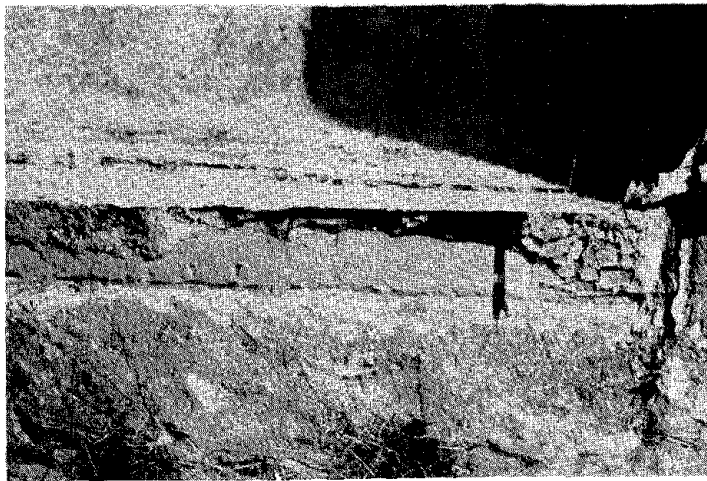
LaAsuncion - West Abutment Foundation Damage
